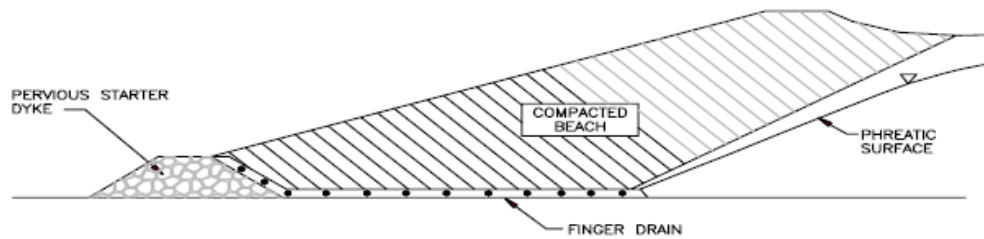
Typical section of improved upstream tailings dam design (Davies, Lighthall et al. 2002).
